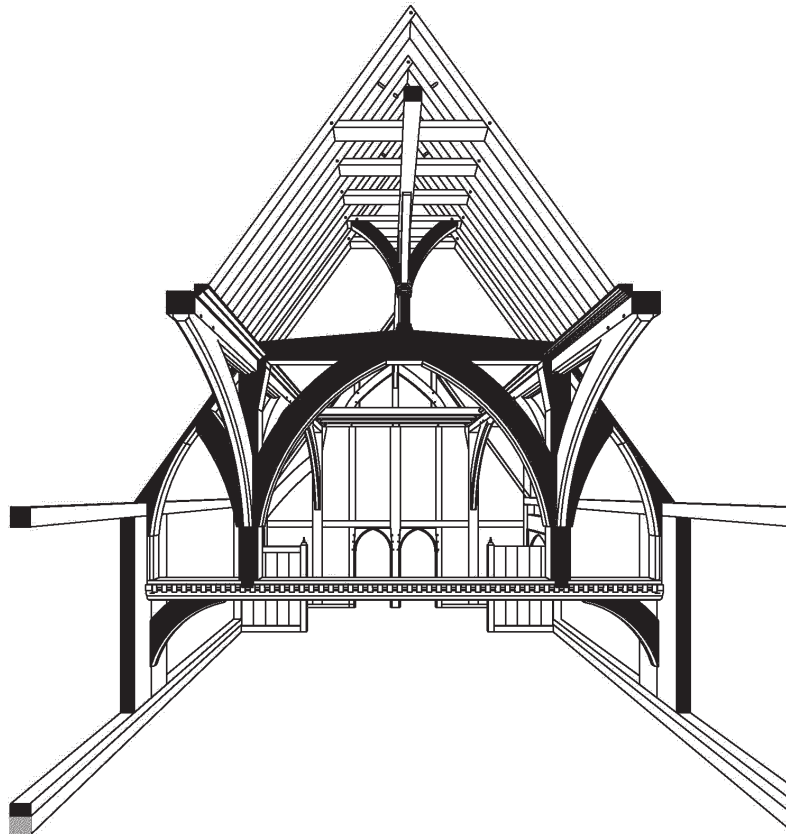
Reconstruction of centre truss of Baythorne Hall, looking west to low end
